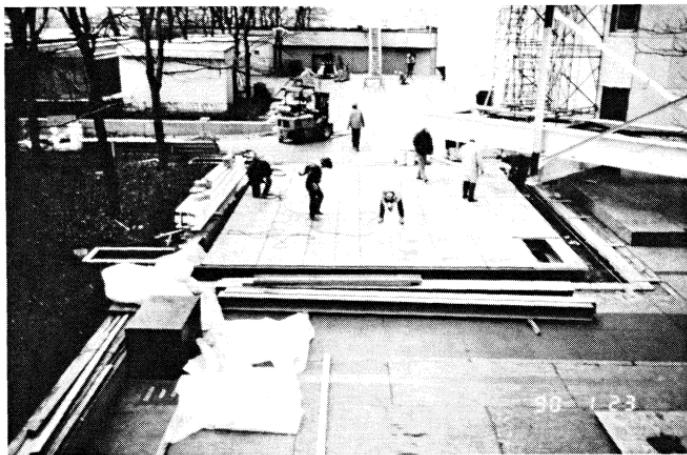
Grillage constructed over plaza areas to support construction loads.
